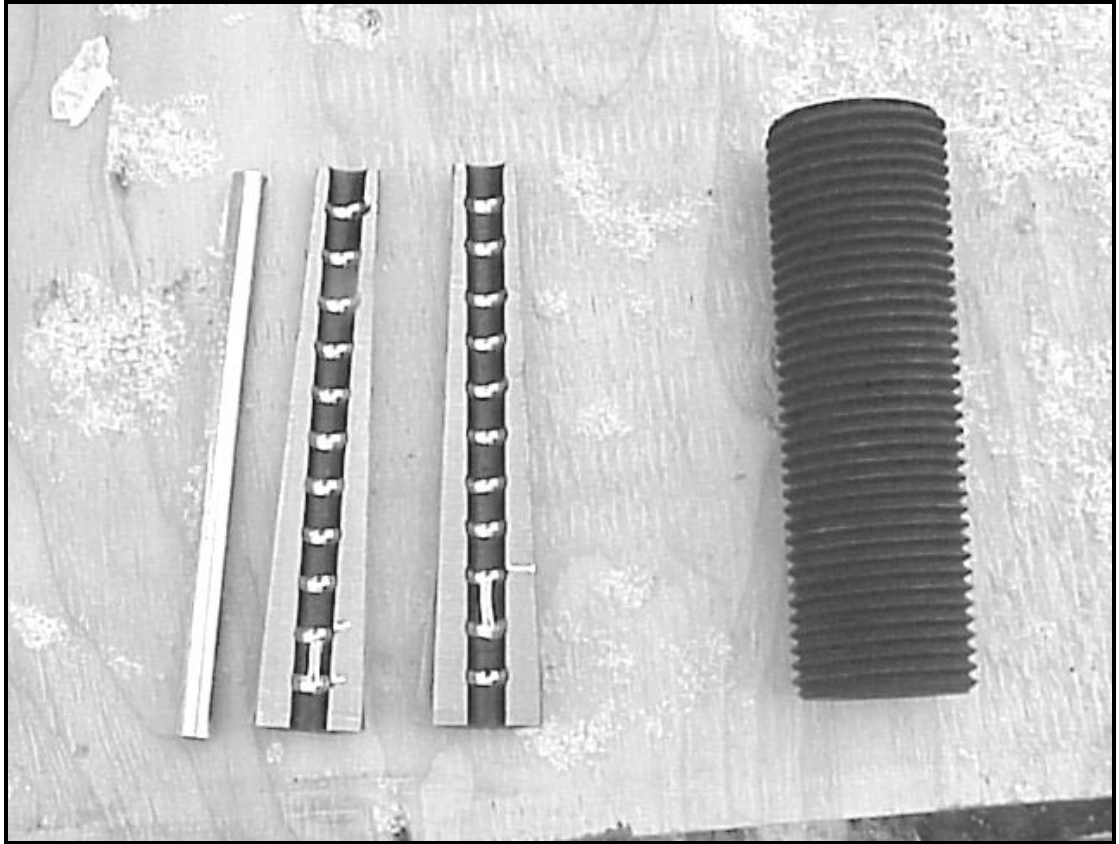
Leadline anchor pieces (left to right, aluminum sleeve, two grooved wedge pieces, steel socket)
